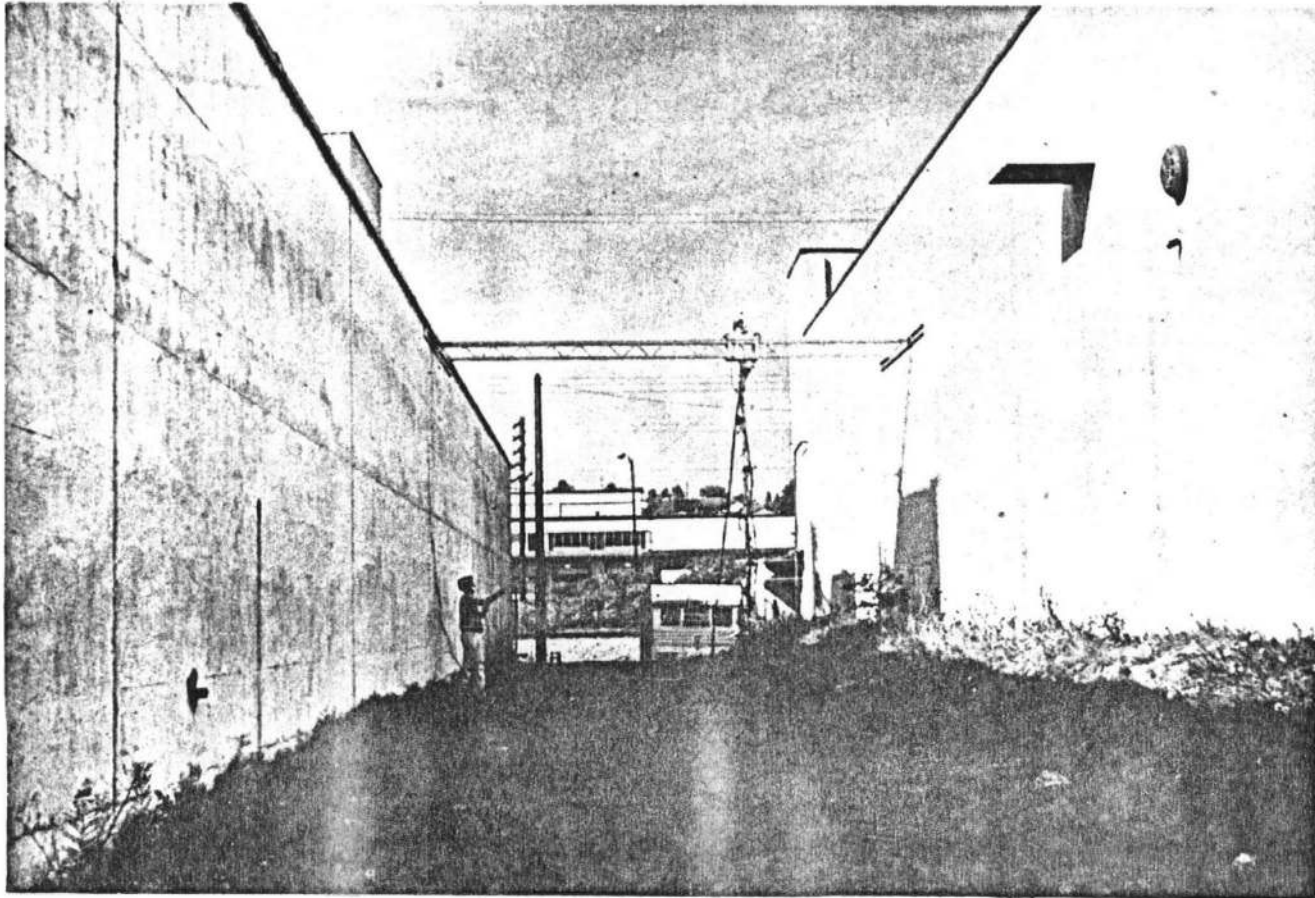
Canyon cross-section viewed from the south end in the early afternoon. Note the boom and the mast arrangement being traversed, also the superstructure shadow on the east wall.
